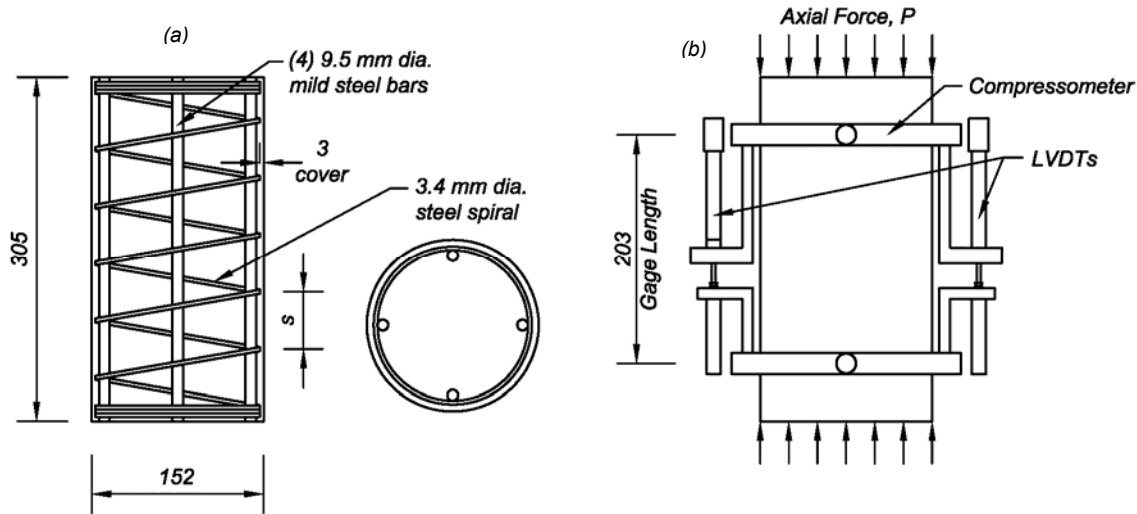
Compression specimen details; (a) cross sections, (b) test configuration
